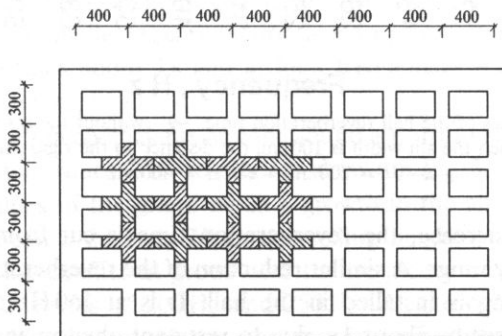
Plan of the resonant suspended ceiling with cross-shaped slits between the planes.
